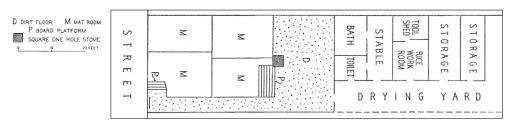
Echigo type. Floor plan showing the house at the side of the street and the outbuildings in the back
